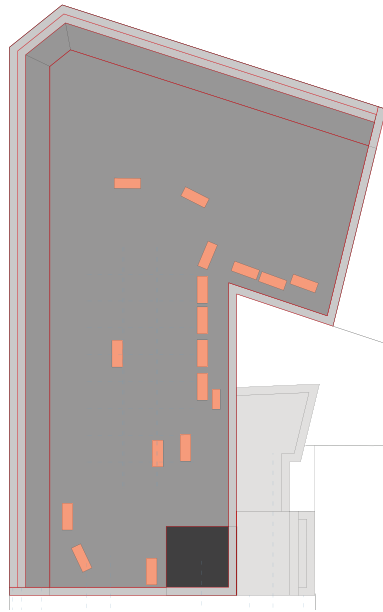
EXISTING ROOF-TOP PLANT - VIEWS ACROSS ROOF TO SOUTH
